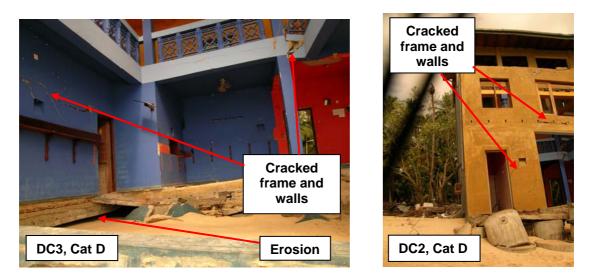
Erosion underneath the foundations resulted in settlement induced damage to an RC frame hotel structure. Damage and settlement of concrete foundations leading to tilting and cracked walls in the RC frame building
